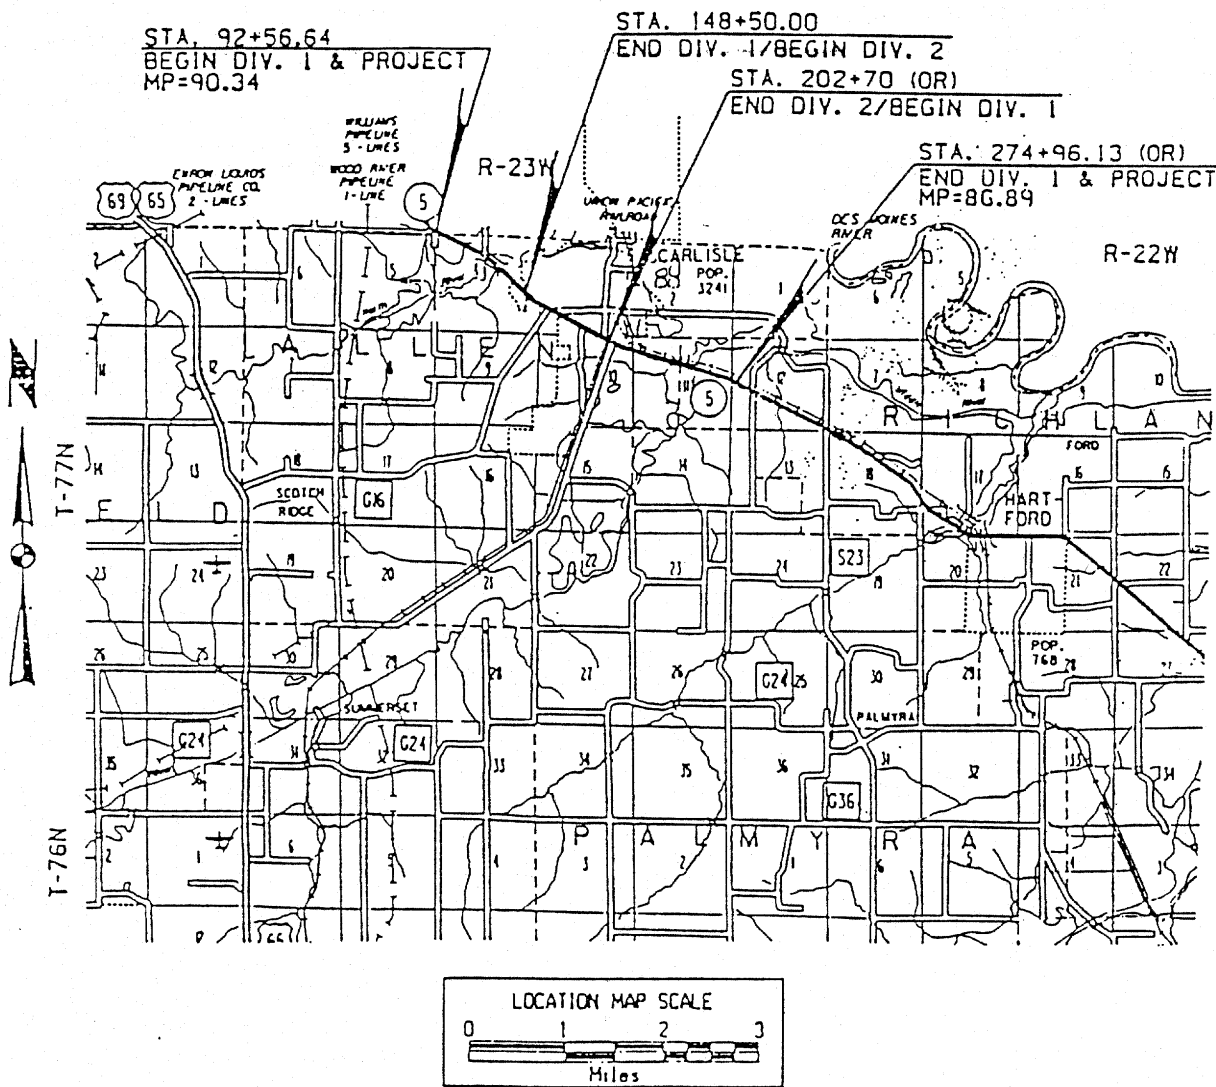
Carlisle, Iowa Highway 5 Construction Site.
